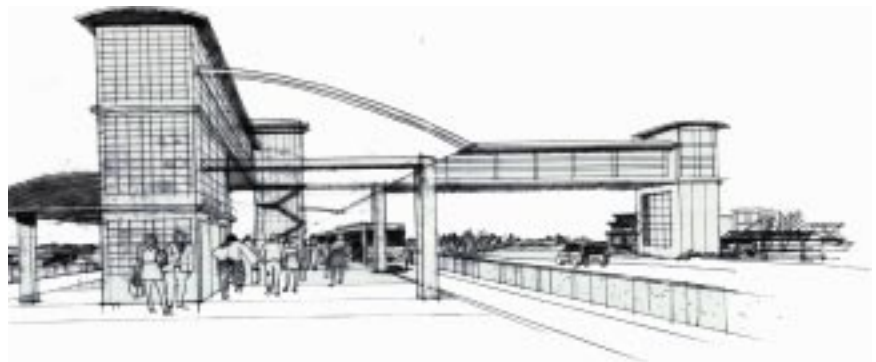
The Dayton Station platform will be located in the median of Interstate 225. Access to the platform will be via stairs and elevators on either side of a pedestrian overpass.
